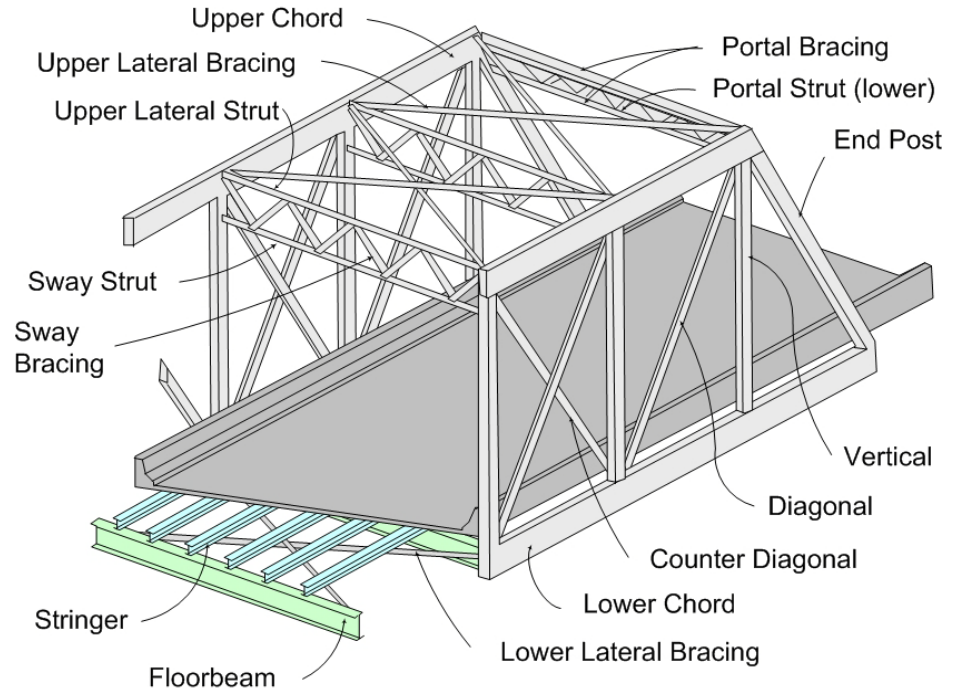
Truss Members, Floor Systems and Bracing
